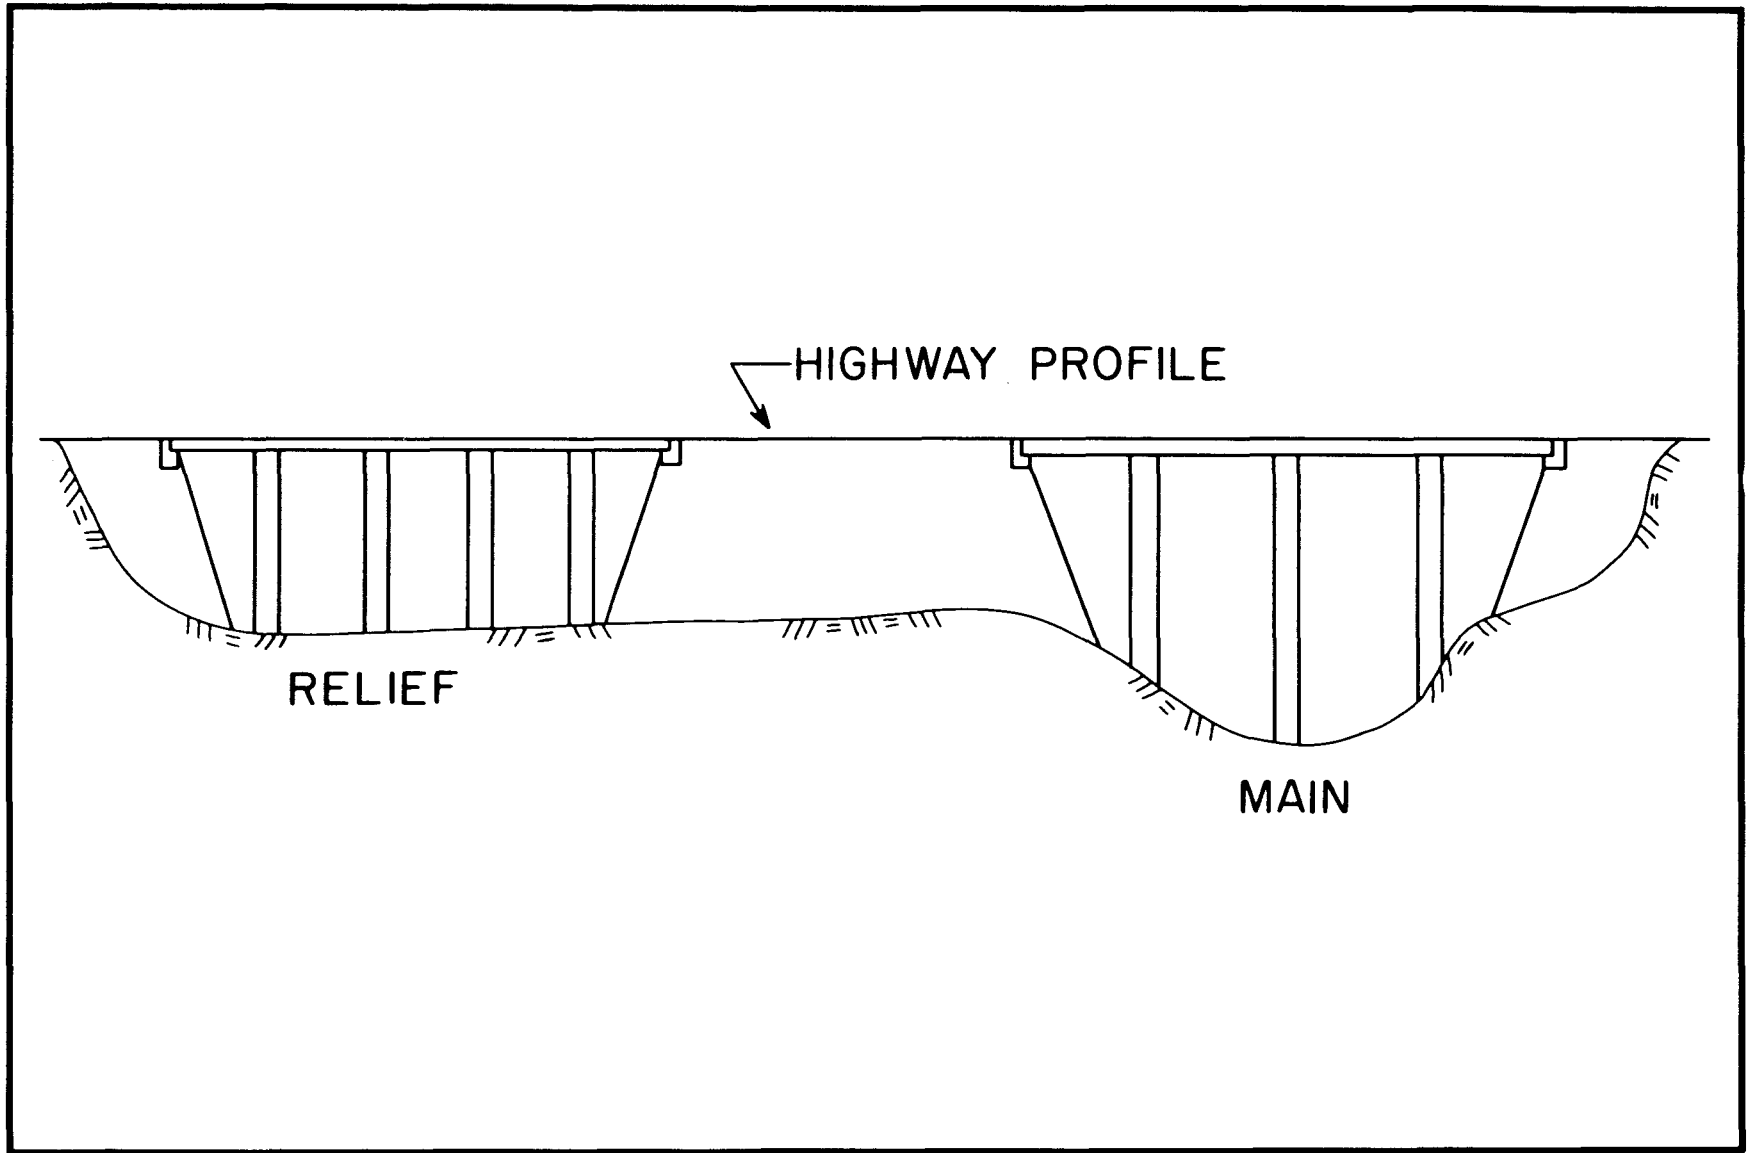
MULTIPLE OPENING BRIDGE INSTALLATION (TWO OPENINGS)
